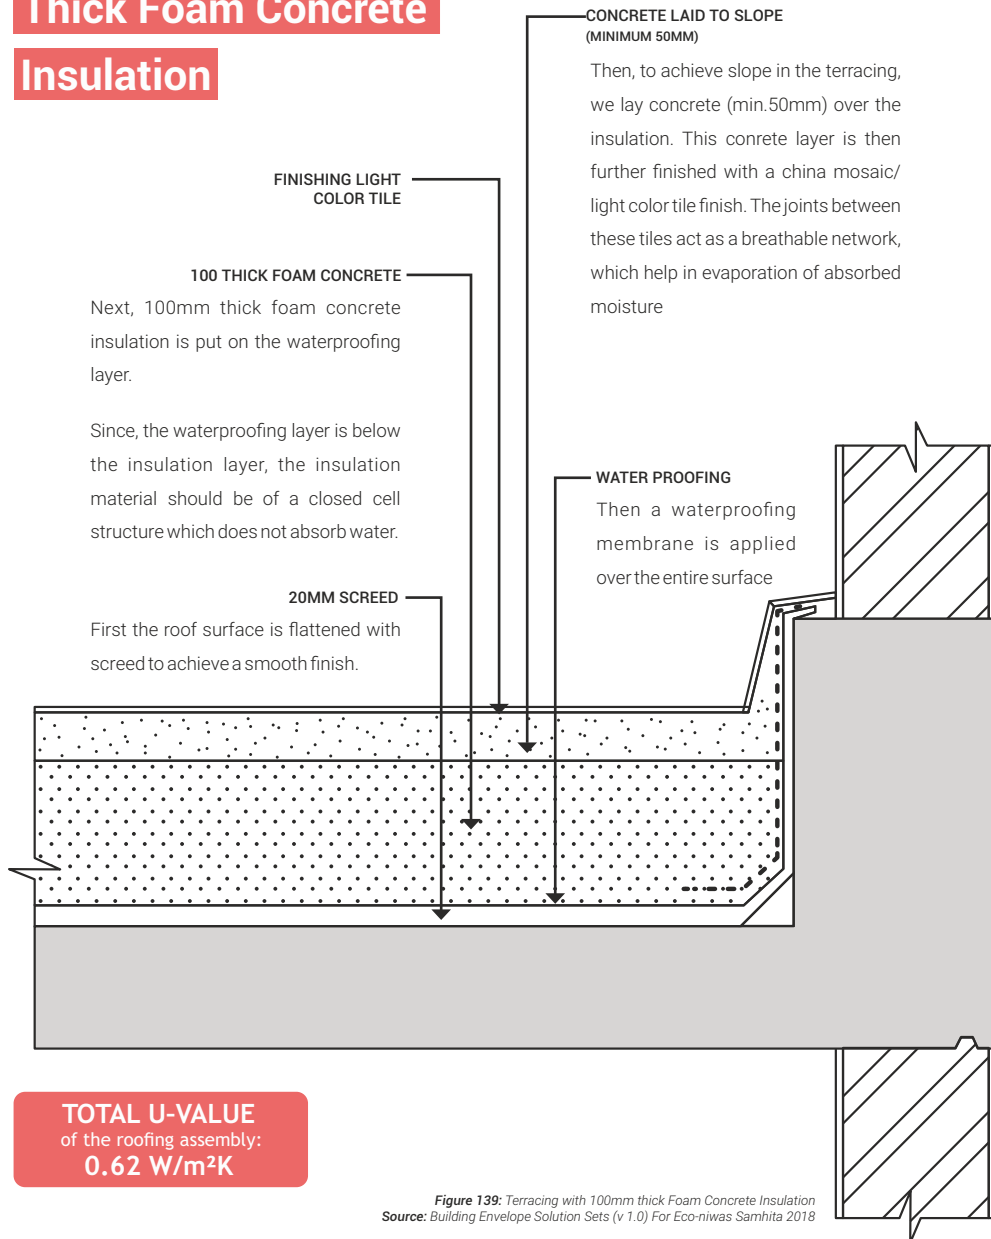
Terracing with 100mm thick Foam Concrete Insulation
